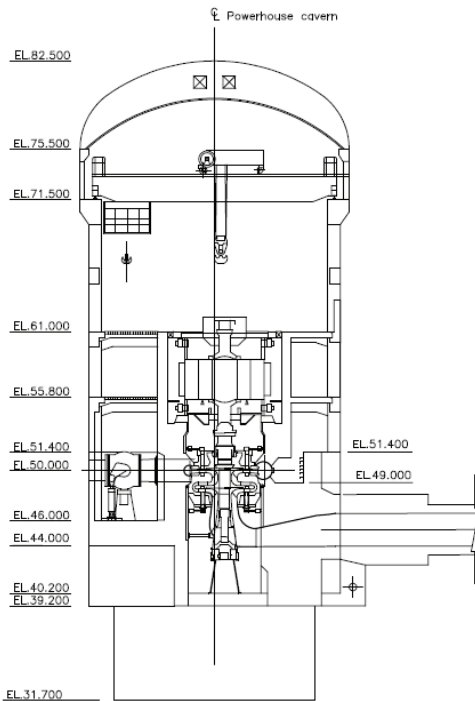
Pump turbine sectional drawing of pumped storage power plant
